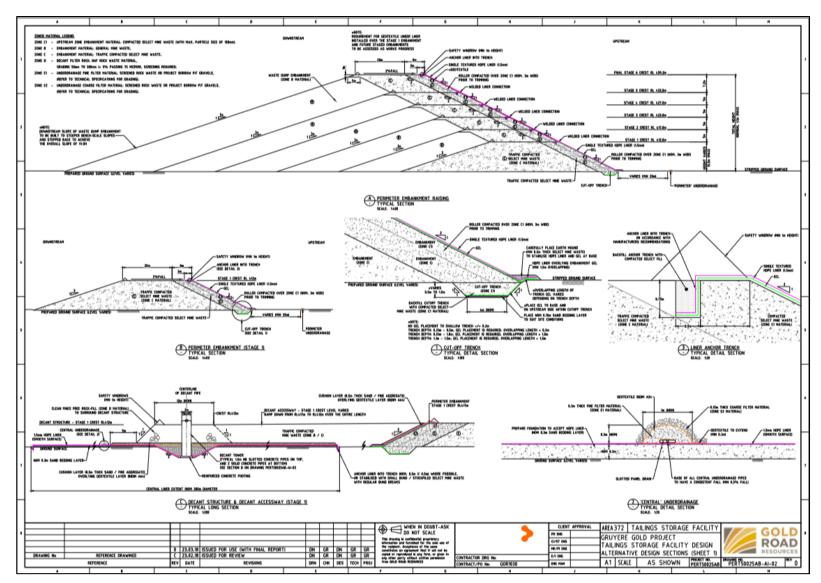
Revised TSF design, cut off trench and underdrainage featured
